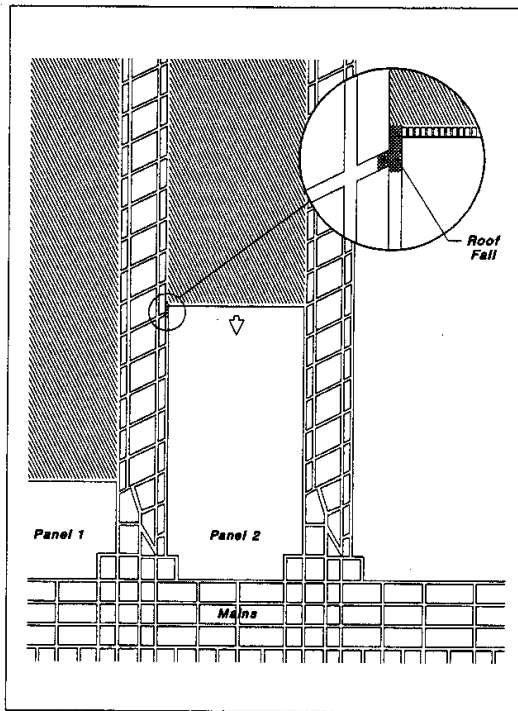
Mine B: Typical Longwall Panel and Tailgate Roof Fall.
